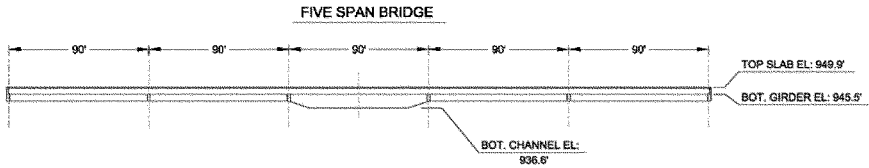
Conceptual design of a bridge over the re-routed Pomme de Terre River.
